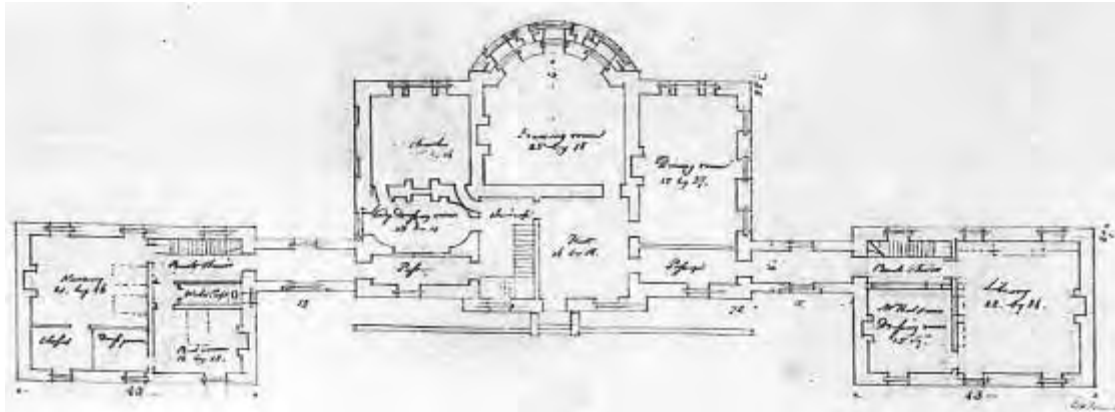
Proposed plan of principal floor Robert Adam July 1790 SJSM
